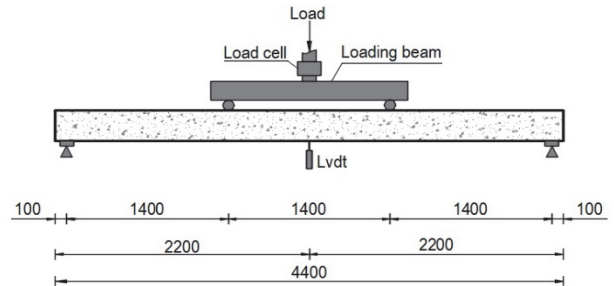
Schematic view of four-point bending test setup (dimensions are in mm)
